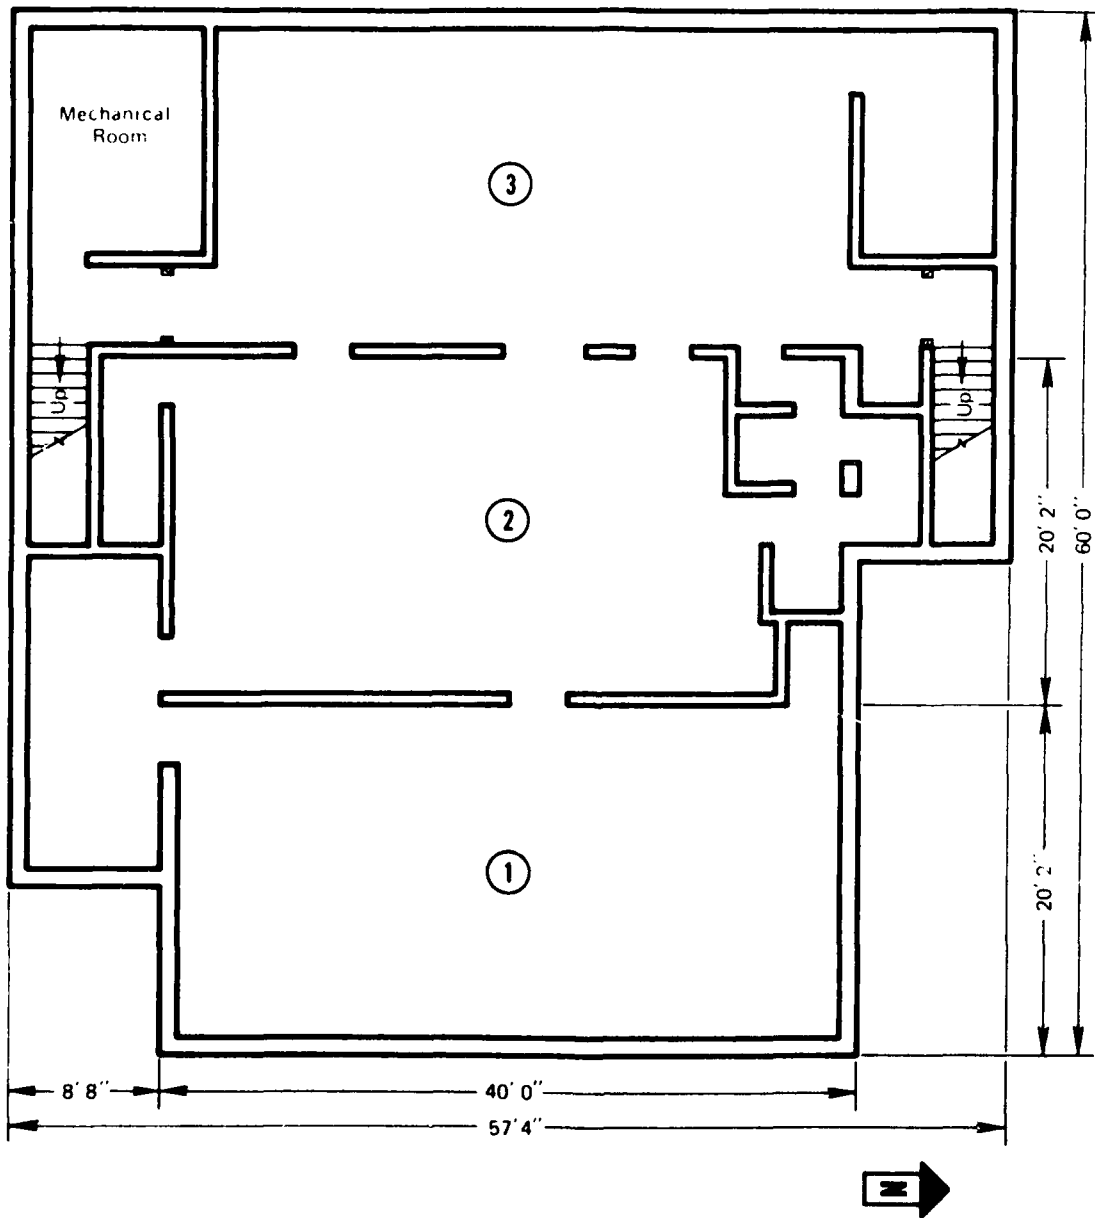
LIVERMORE EOC BASEMENT FLOOR PLAN
